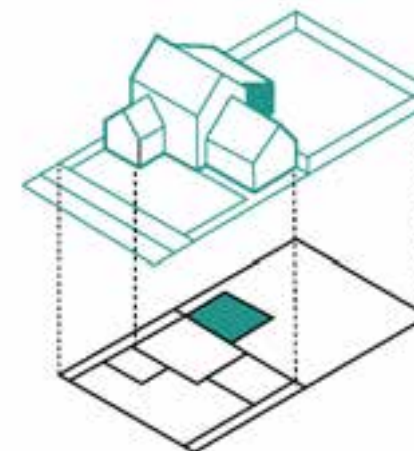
An acceptable example of a rear extension with a roof form and pitch which sits below the main ridge line of the original building.
